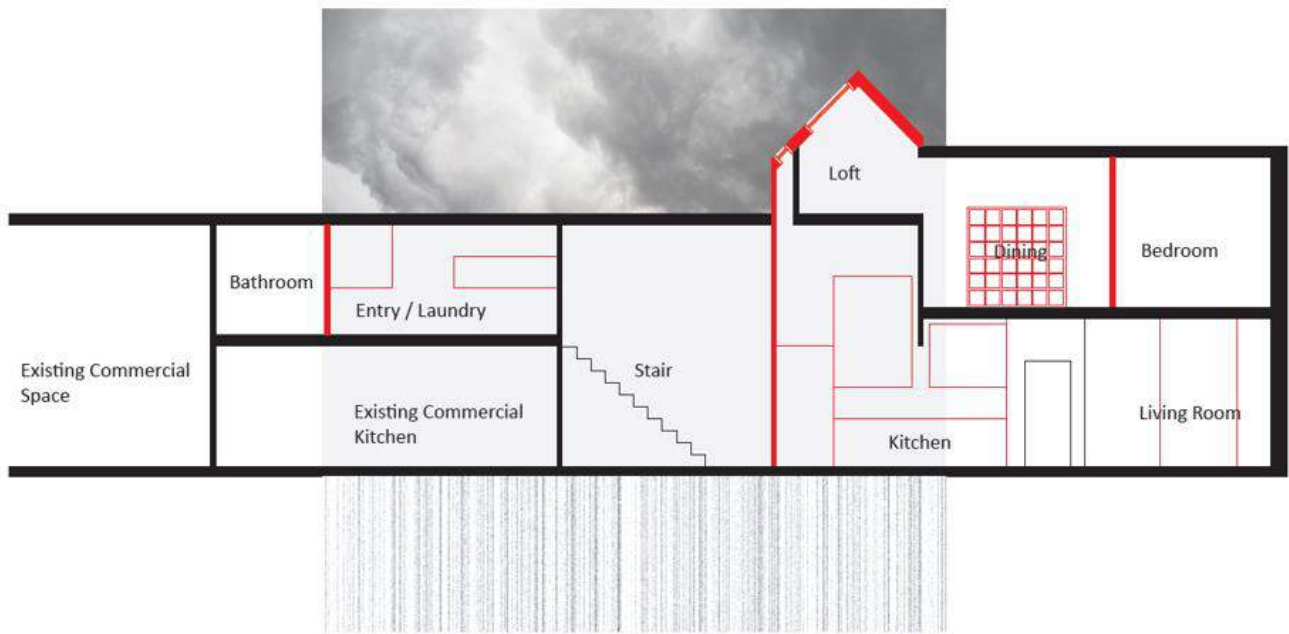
Section of Proposed Design 18W 1st St, Duluth MN.
